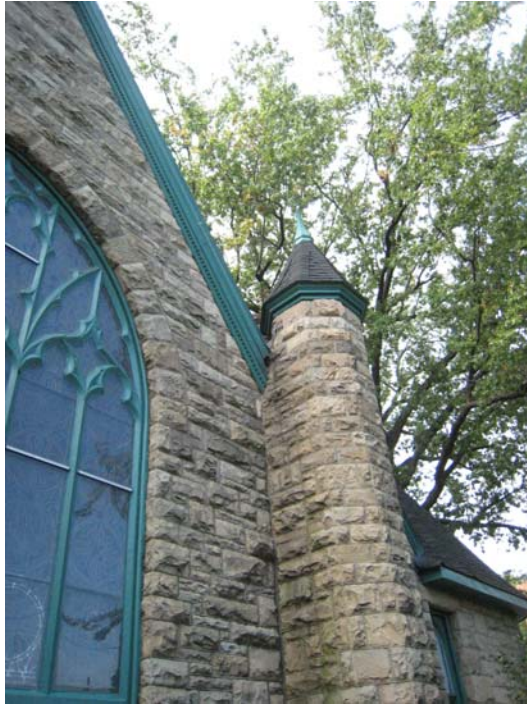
View of Church South façade showing the observed deflection at the top of the wall.
